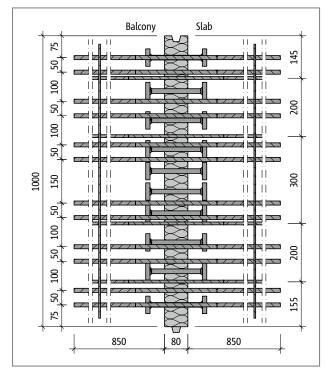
Schöck Isokorb® T type K-M12-V1: Product layout
